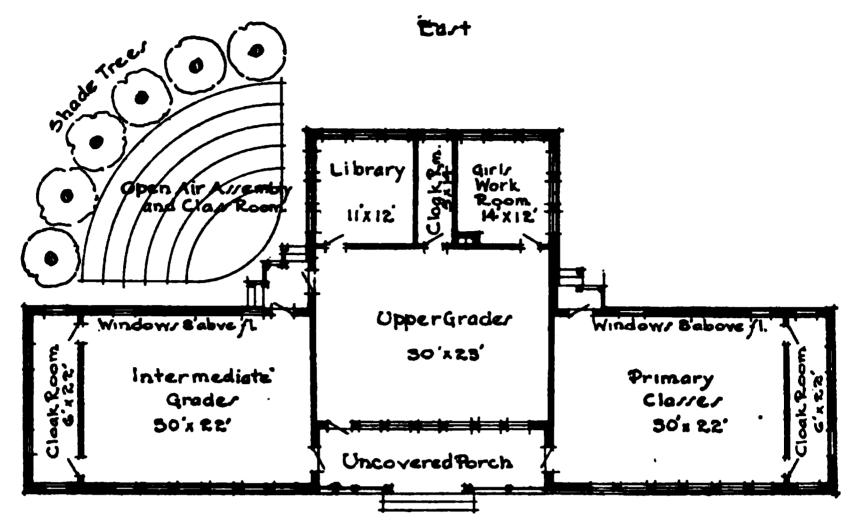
Floor plan, three-teacher consolidated rural school with open-air assembly and class room.
